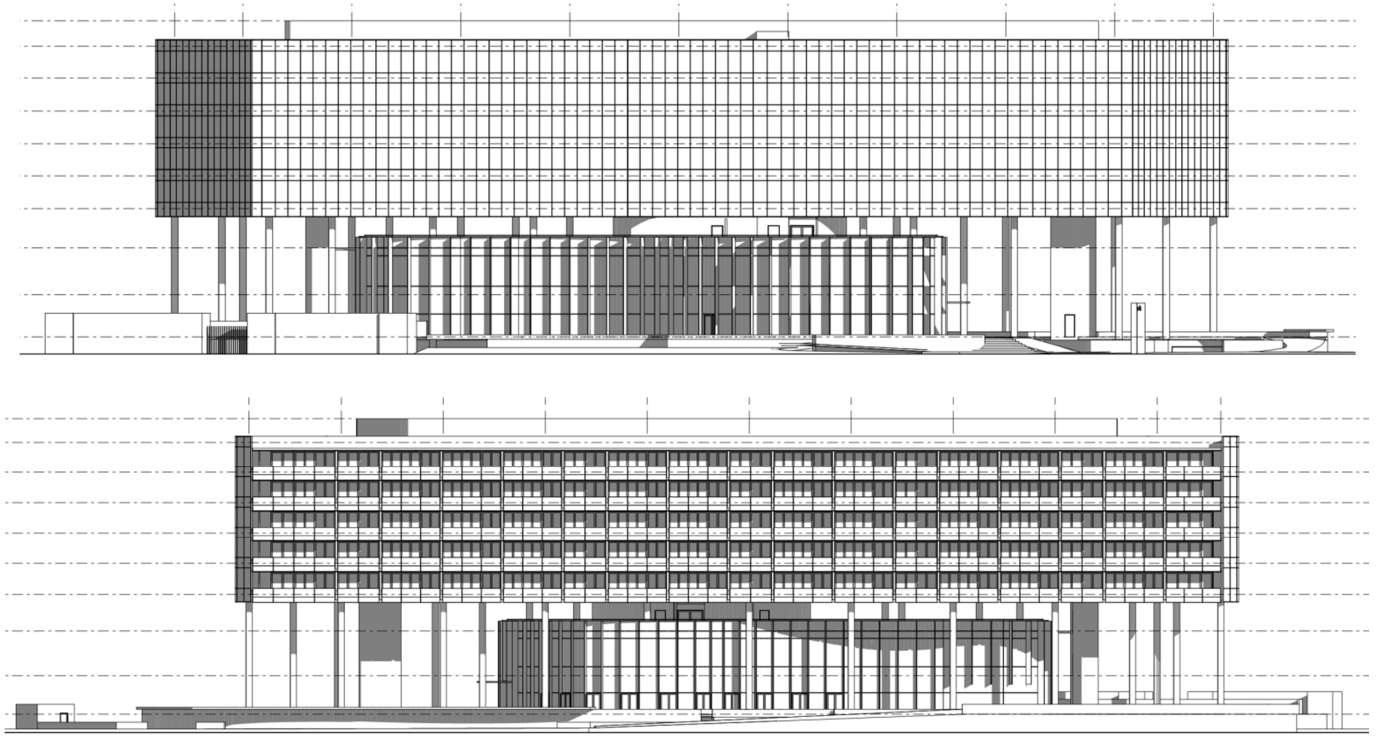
North and South Elevation Drawings (Curtsey of TZG, 2012)
